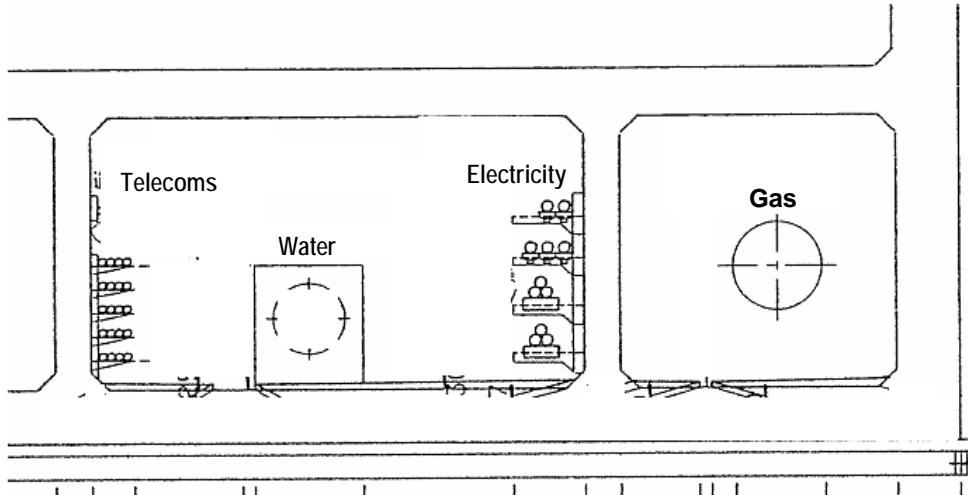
Example of a Multi Purpose Tunnel with the gas main in a separate compartment in the tunnel
